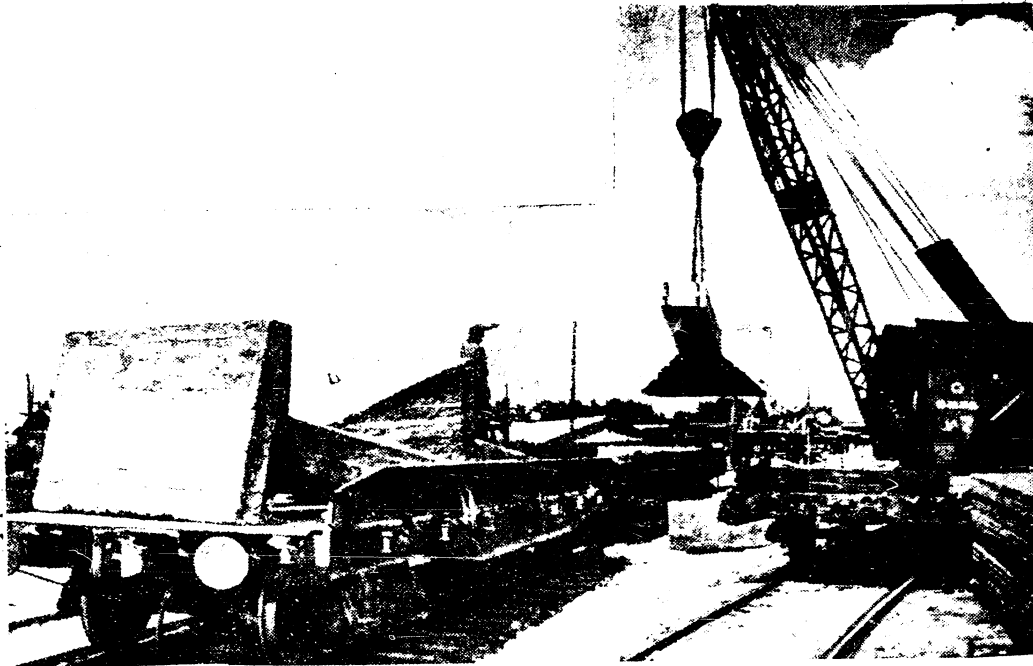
Loading foundations for reinforced concrete supports produced at Belorechenskaya
